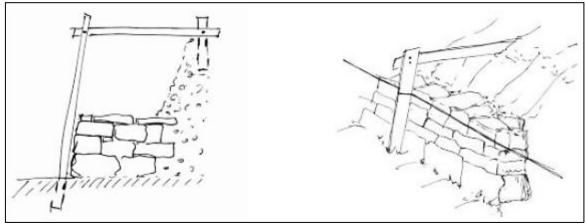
Structure made of wood poles, to maintain the proper horizontal position and wall inclination (picture from Sangiorgi et al., 2006).
